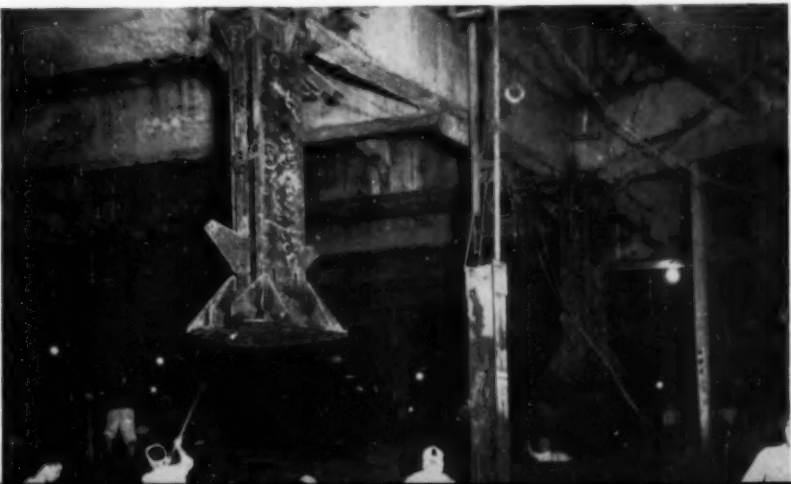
As caisson neared point where it was to be founded, in gravel, fourth basement was excavated and foundations prepared for interior columns. Columns were then extended downward so that they would rest on these foundations when caisson reached final position. Cutting edge then became exterior wall of lowest basement. Temporary internal bracing was removed after columns were seated on their foundations.
